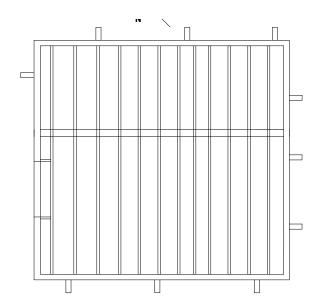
Plan of first floor floor framing. (T. Jones, NPS-SERO-CR, 2002
